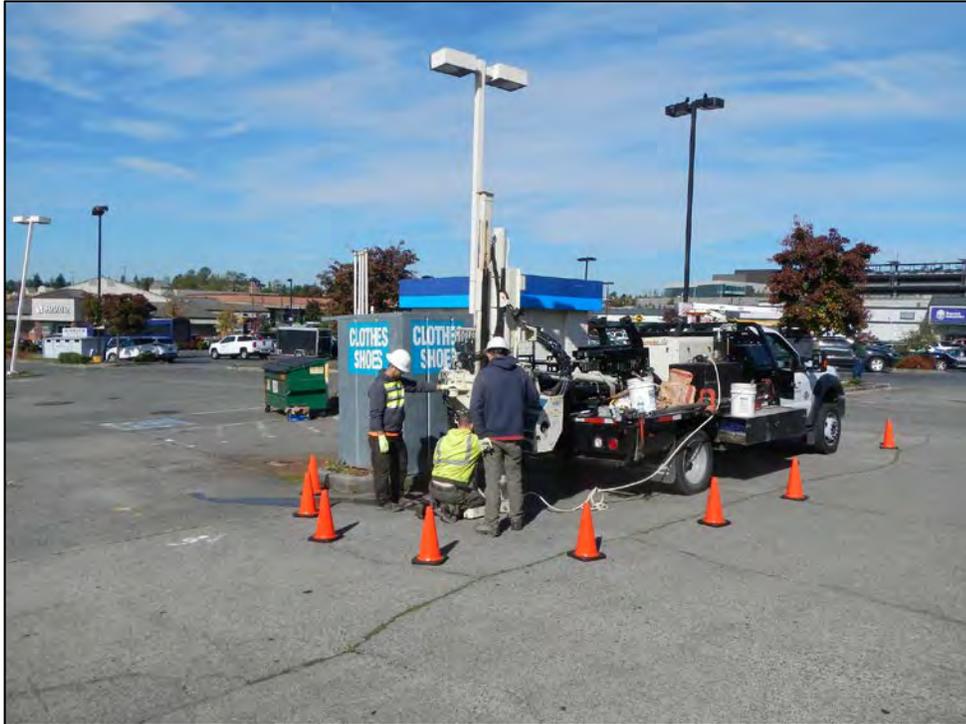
FL363-B5 location in shopping center access road north of the ARCO. View to north.
